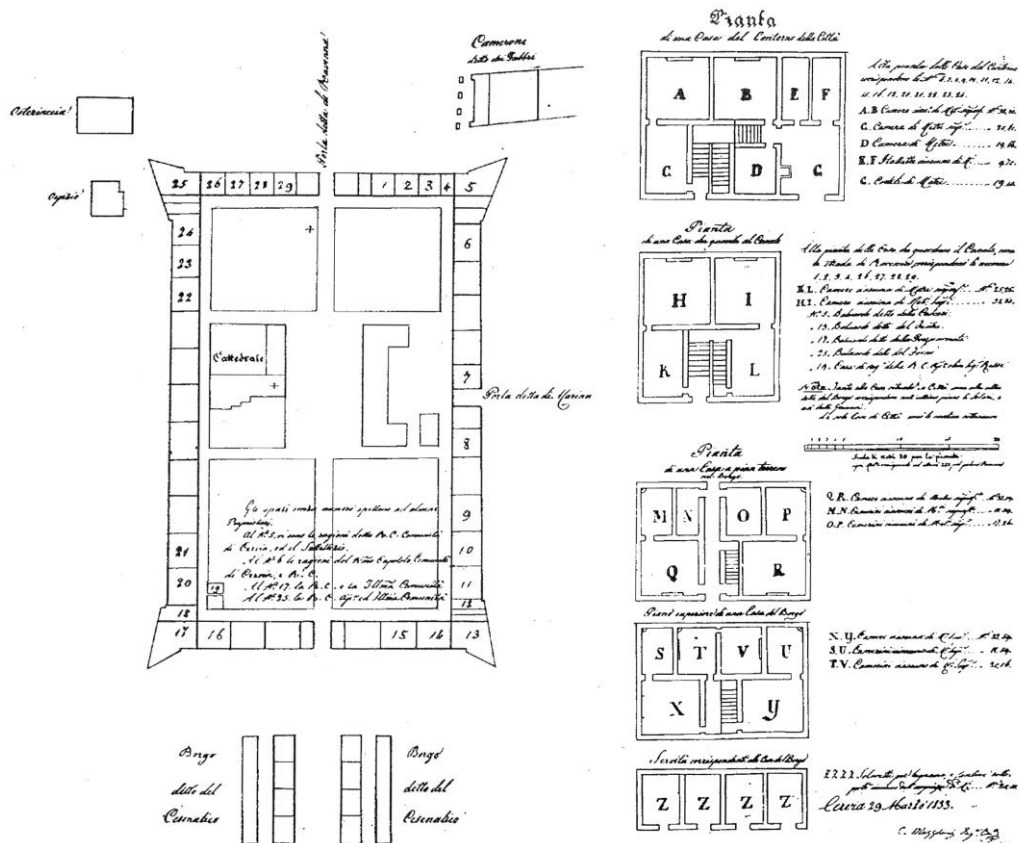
Left: plan of Cervia in 1833 with the salt workers' houses by engineer Carlo Mazzolani; right: plans of the salt workers' houses in 1388 by engineer Carlo Mazzolani (State Archives of Rome).
